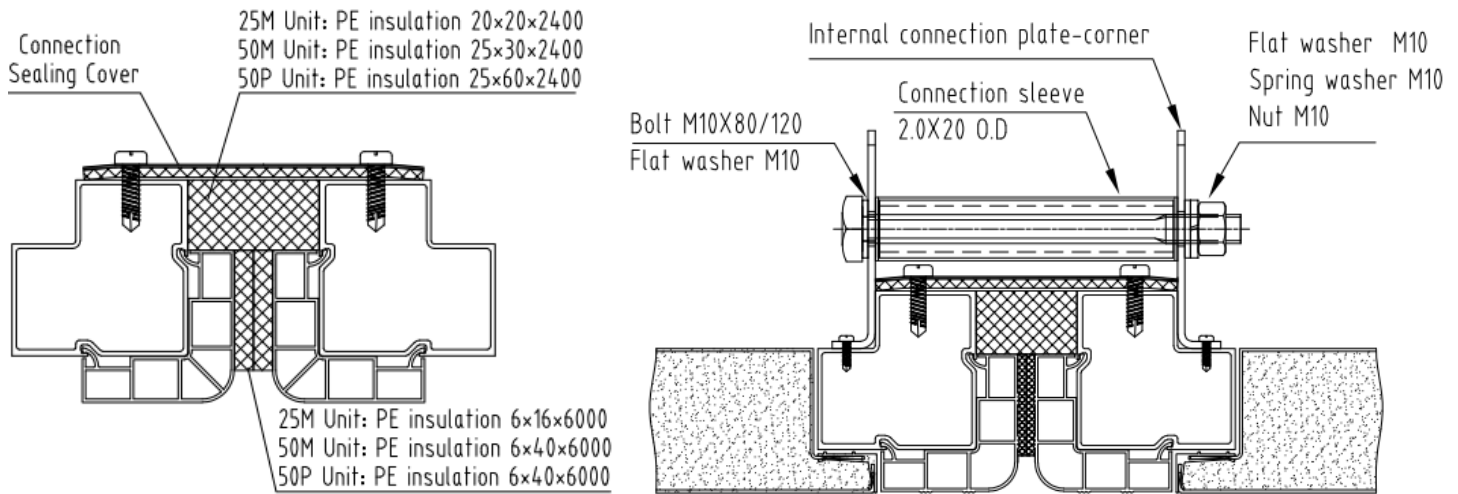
Splits Thermal Insulation & Connection Instruction
